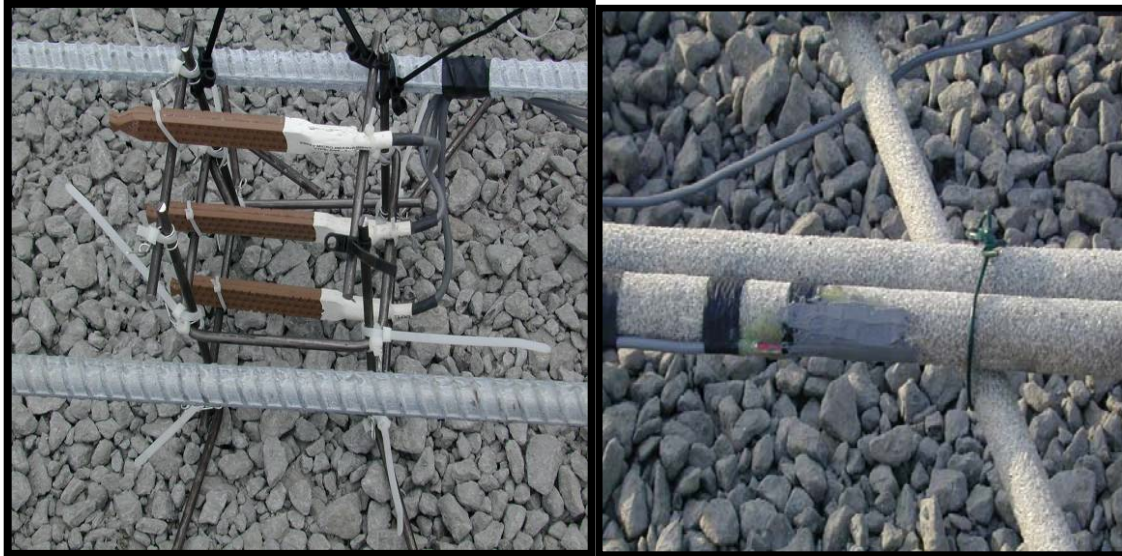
Electrical strain gage in concrete and on GFRP bars
